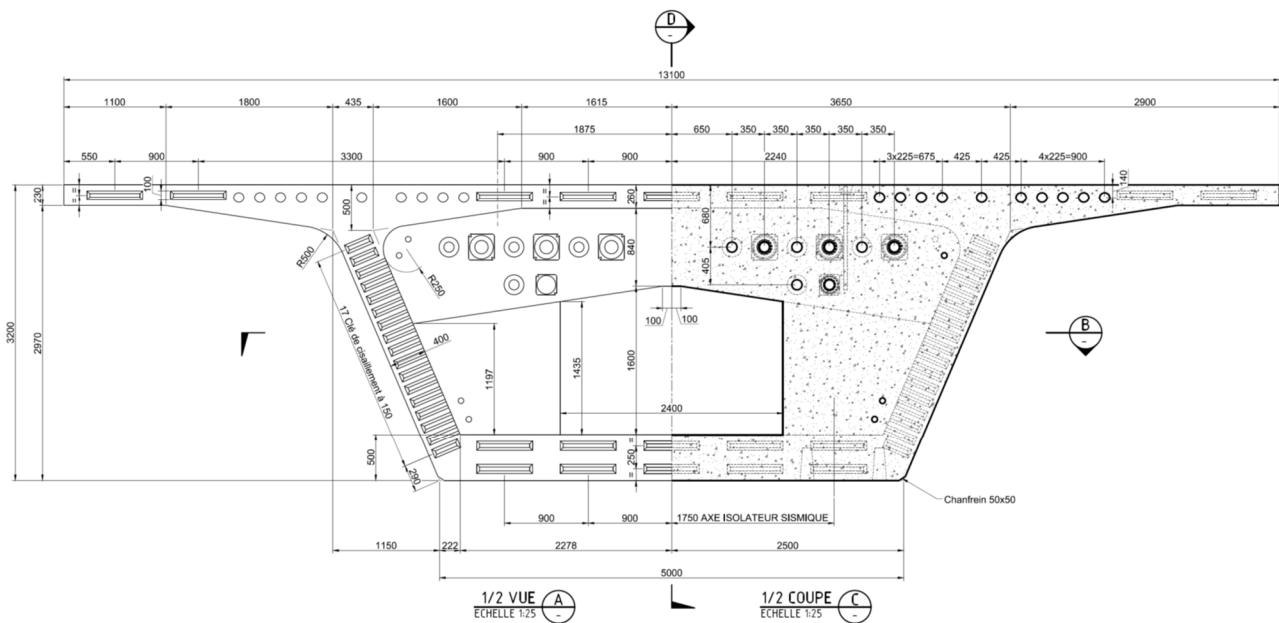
Cross section of Pier Segment / Sezione trasversale del concio di pila.
